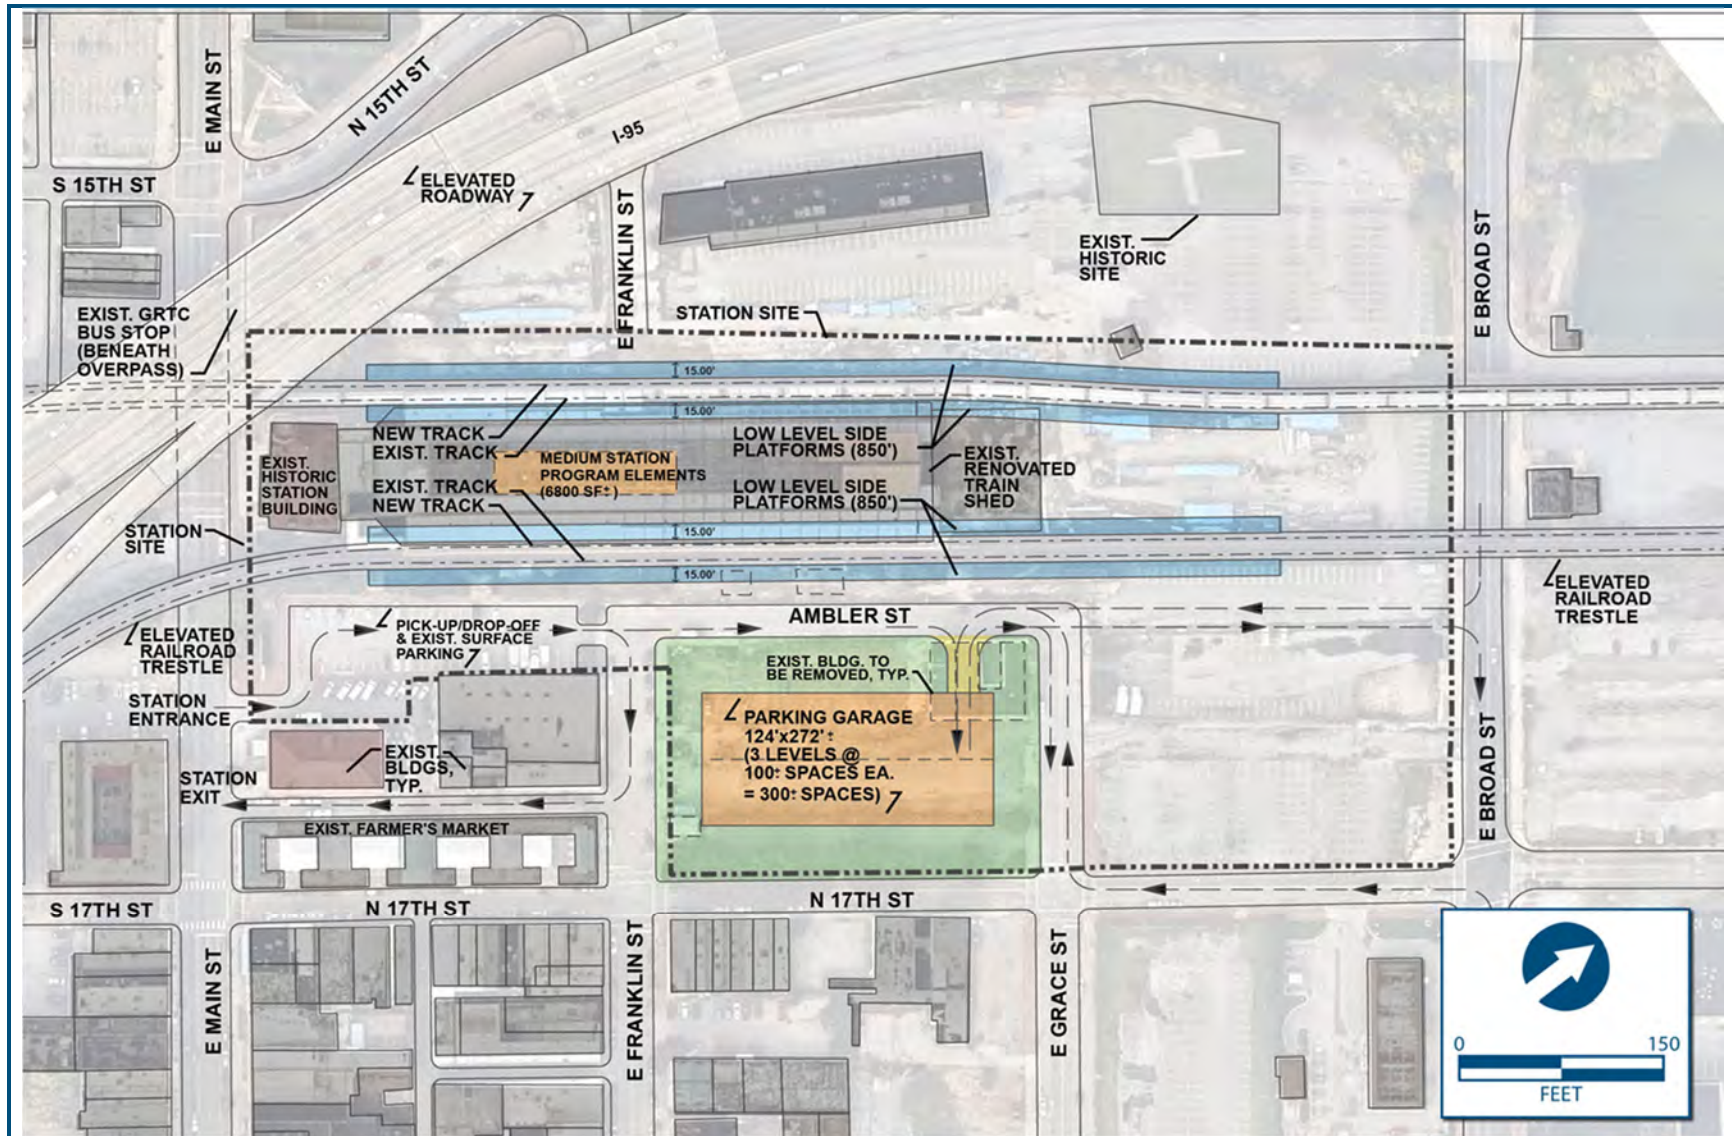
Main Street Station Improvements for Build Alternative 6F
